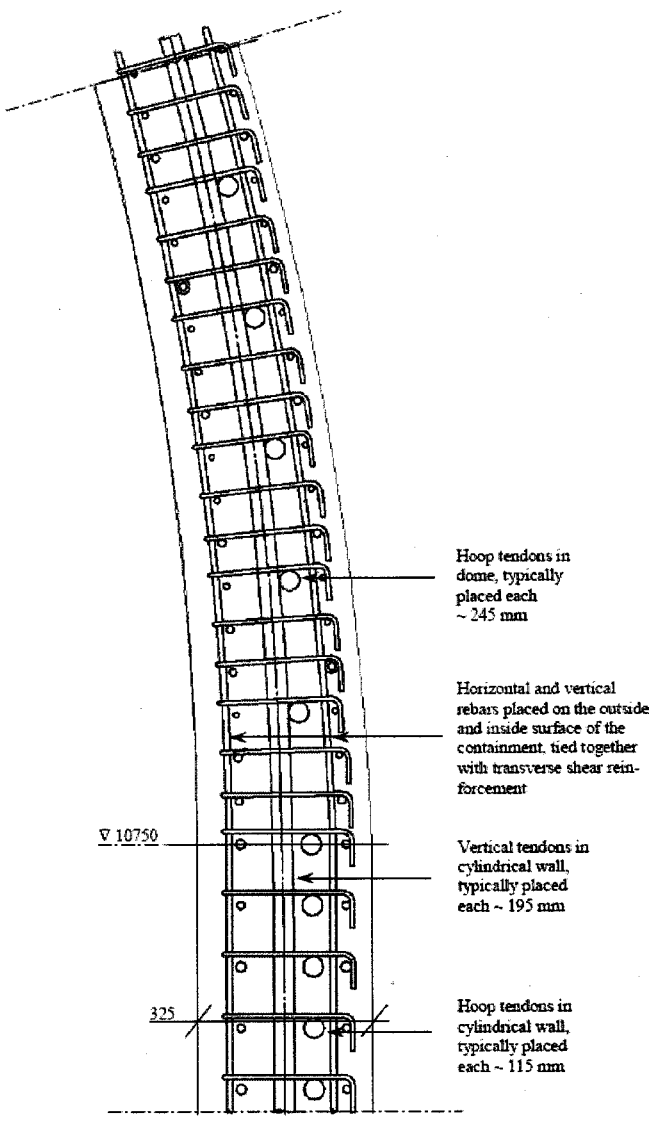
Pre-stressing tendons and rebar arrangement, section through wall/dome.
